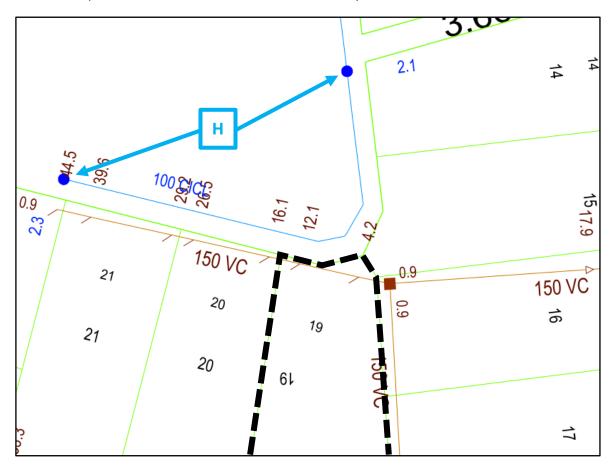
Section Sydney Water Reticulated Mains Water Supply Layout Plans
